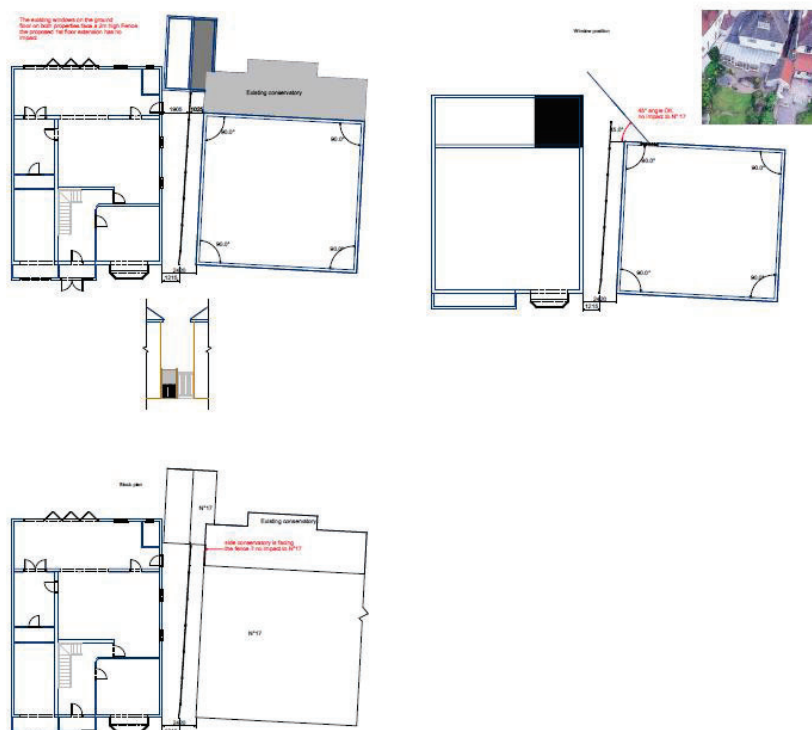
Existing and Proposed Plan (please note – larger version of plan can be found in the Committee Plan Pack)
